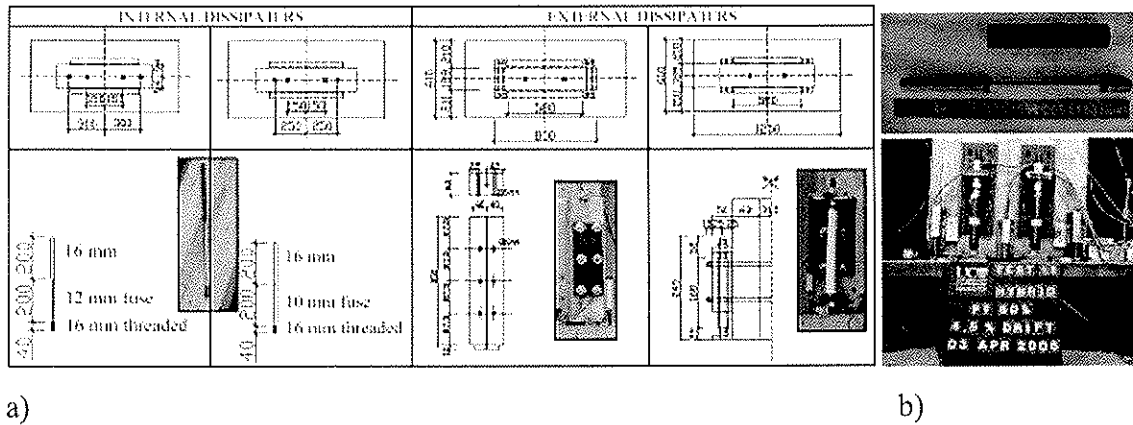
a) Details of internal and external dissipaters used for the wall specimens; b) dissipaters detail for of the column-to-foundation specimens.
